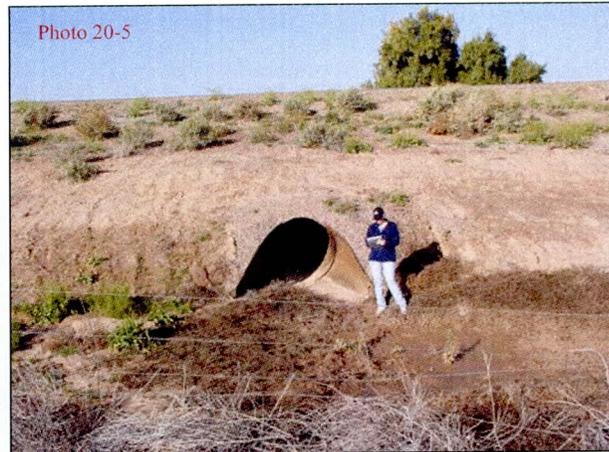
Left bank raised roadway to bridge approach with low-flow culvert, looking downstream direction
